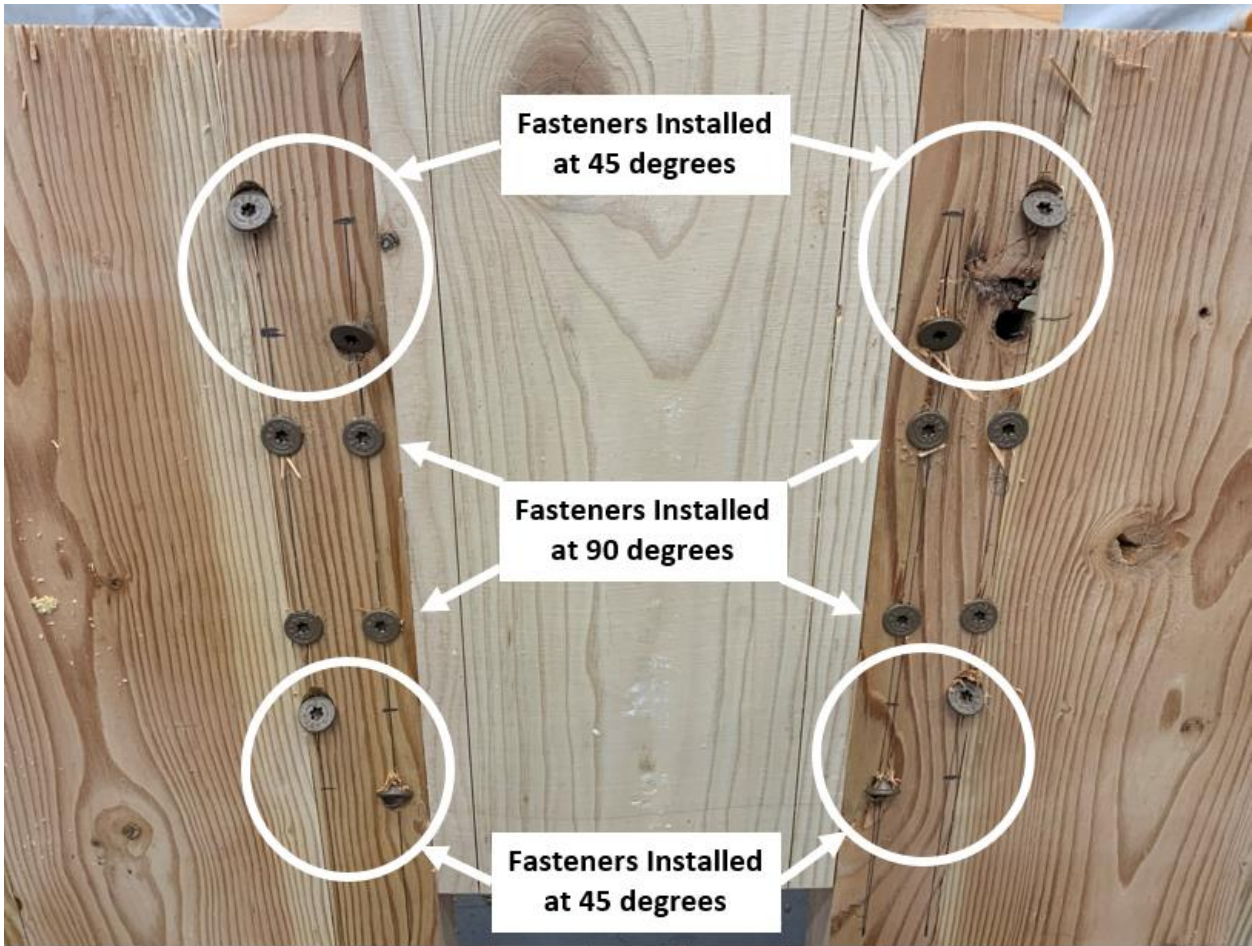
Photo of Specimen 3 Showing Angled Fasteners
